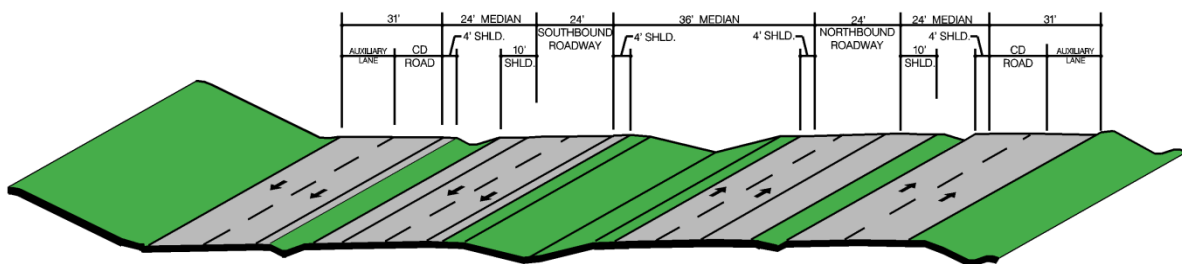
Existing I-81 Typical Section (at the I-70 interchange)
